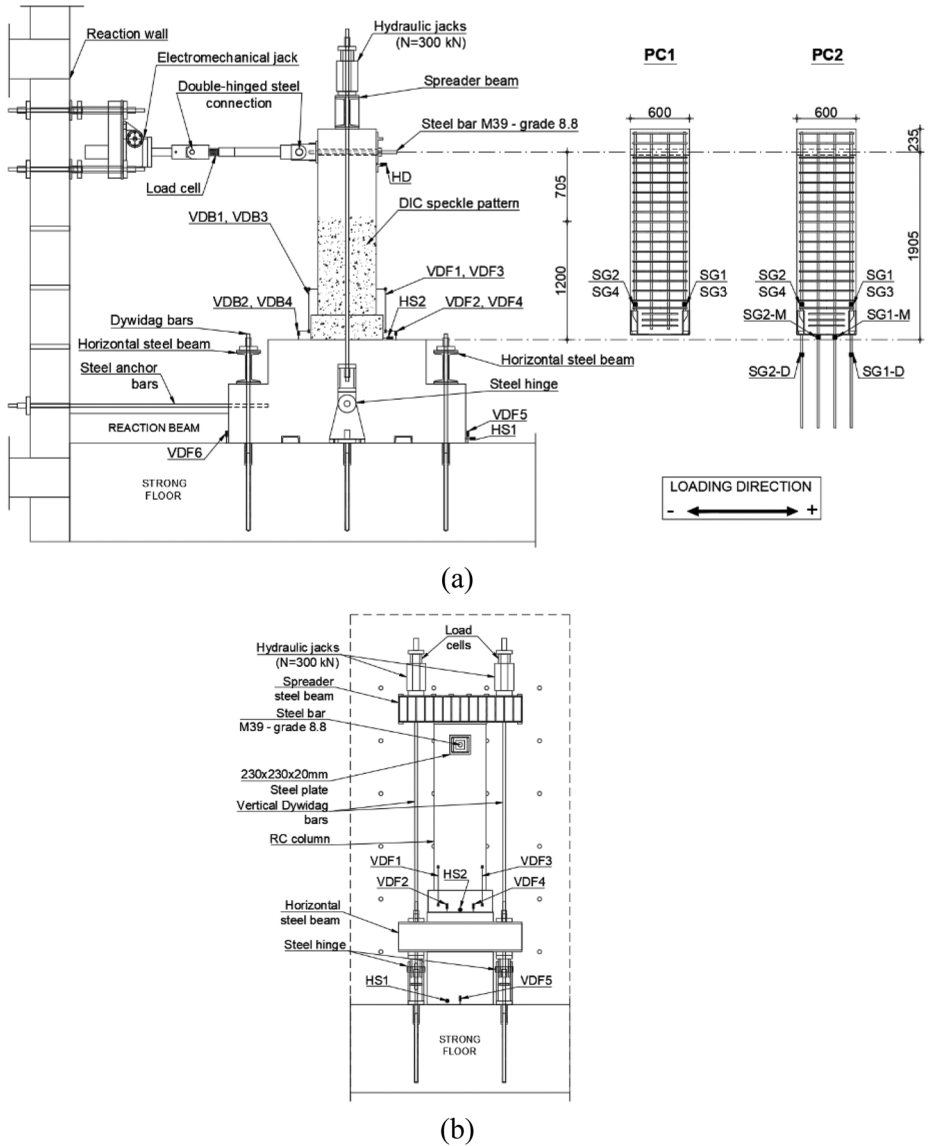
Test set-up: (a) right-side view; (b) front view. (dimensions in [mm])
